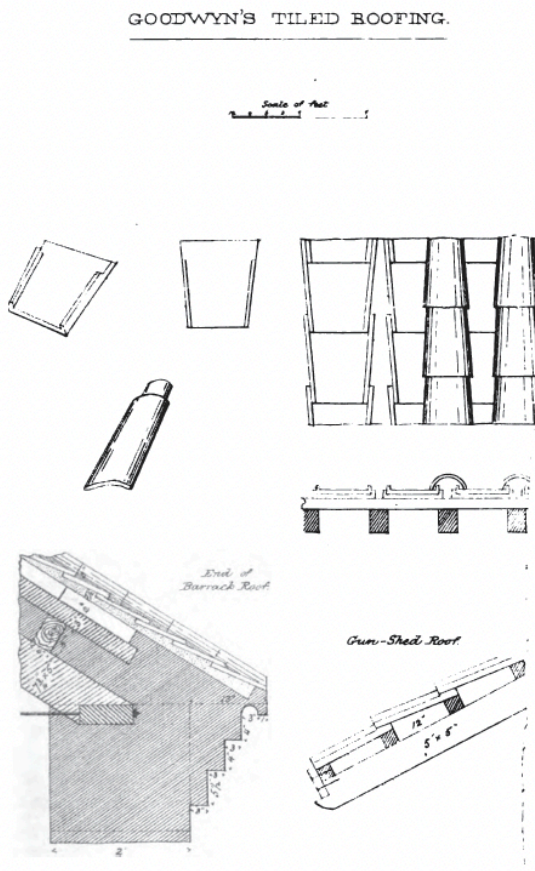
The Goodwyn tiled roofing drawings that were first published in 1864 (Source: Peile, 1864 p134).
